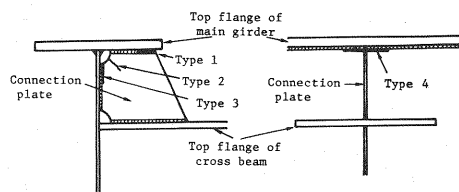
Fatigue cracks at cross beam connection.
